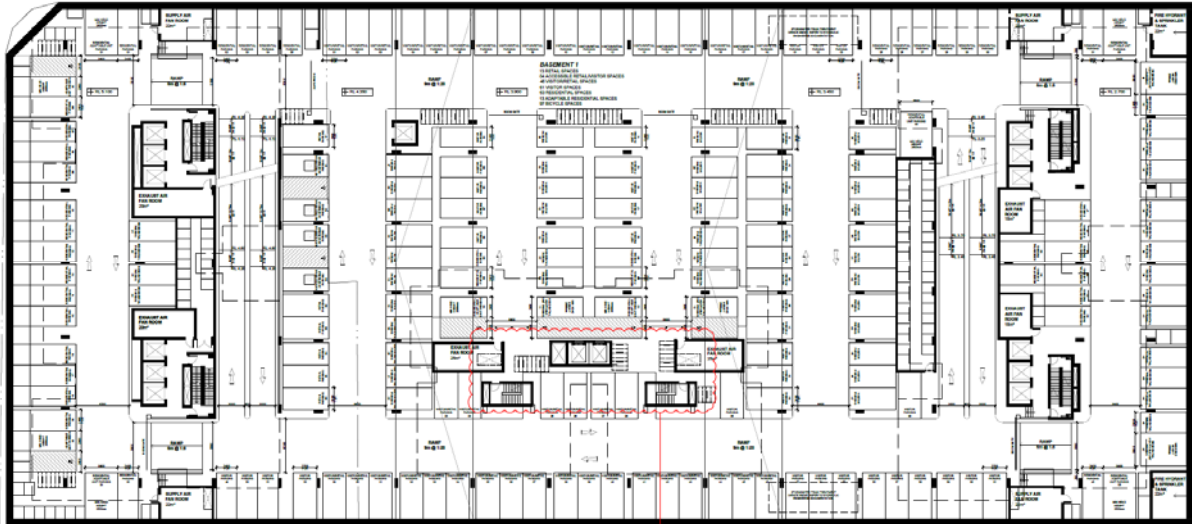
Approved basement level 1 plan under DA/961/2015/A. Source: Marchese Partners, Revision F, dated 14 May 2018
